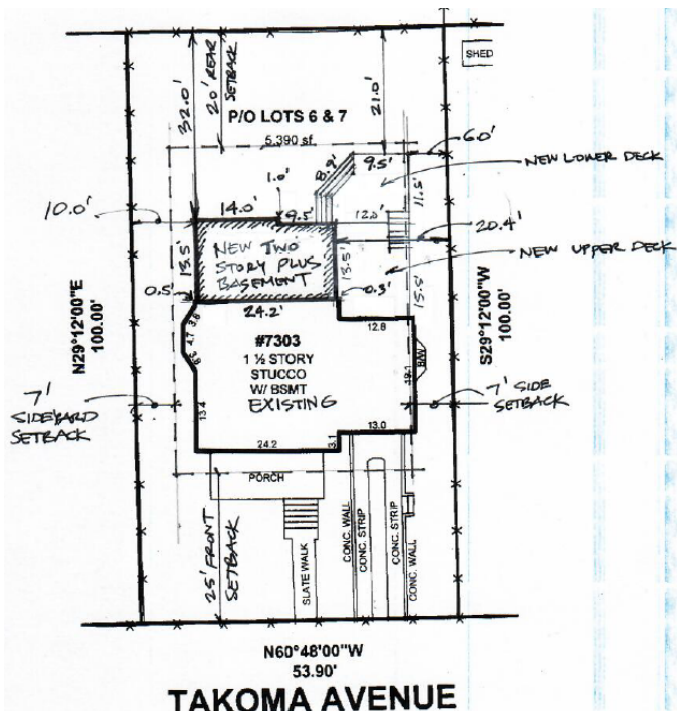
Site plan showing the dimensions of the proposed addition and decks.
